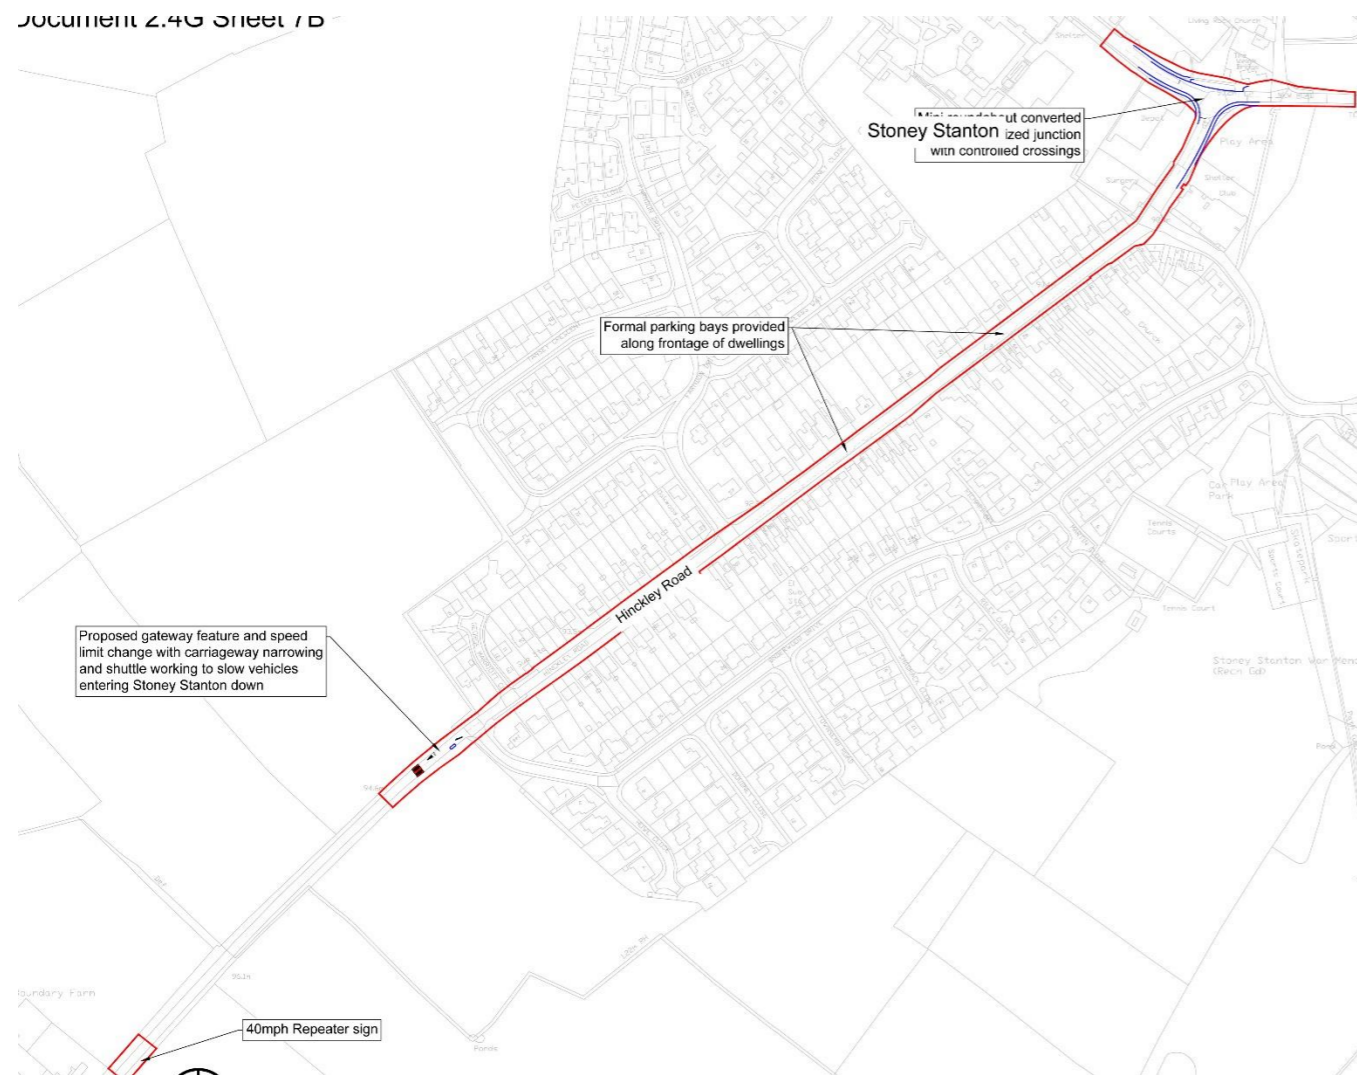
Proposed Works to the Hinckley Road, Stoney Stanton
